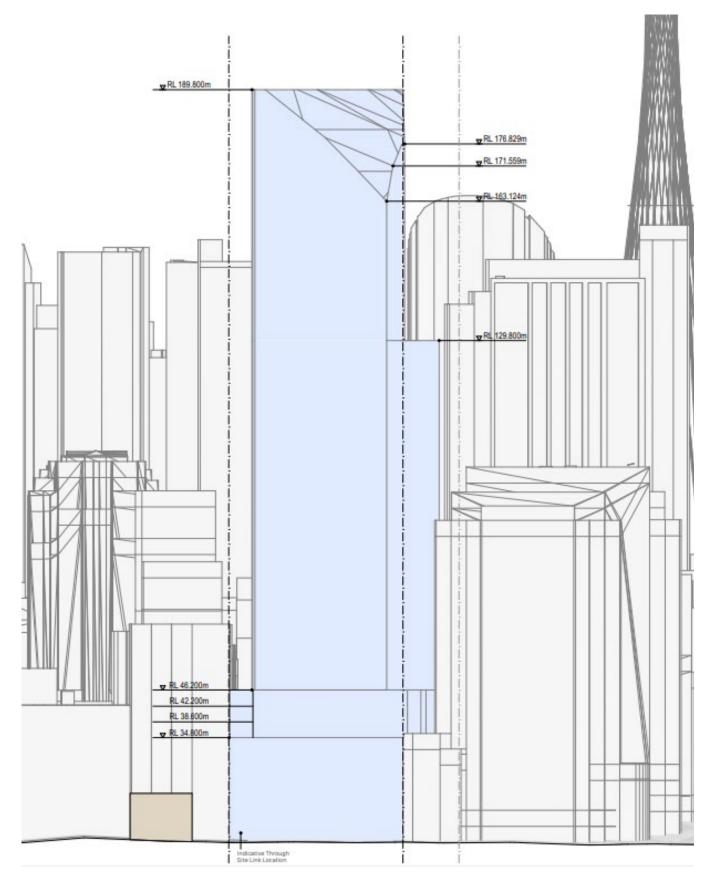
Proposed Planning Envelope Elevation at Sussex Street
